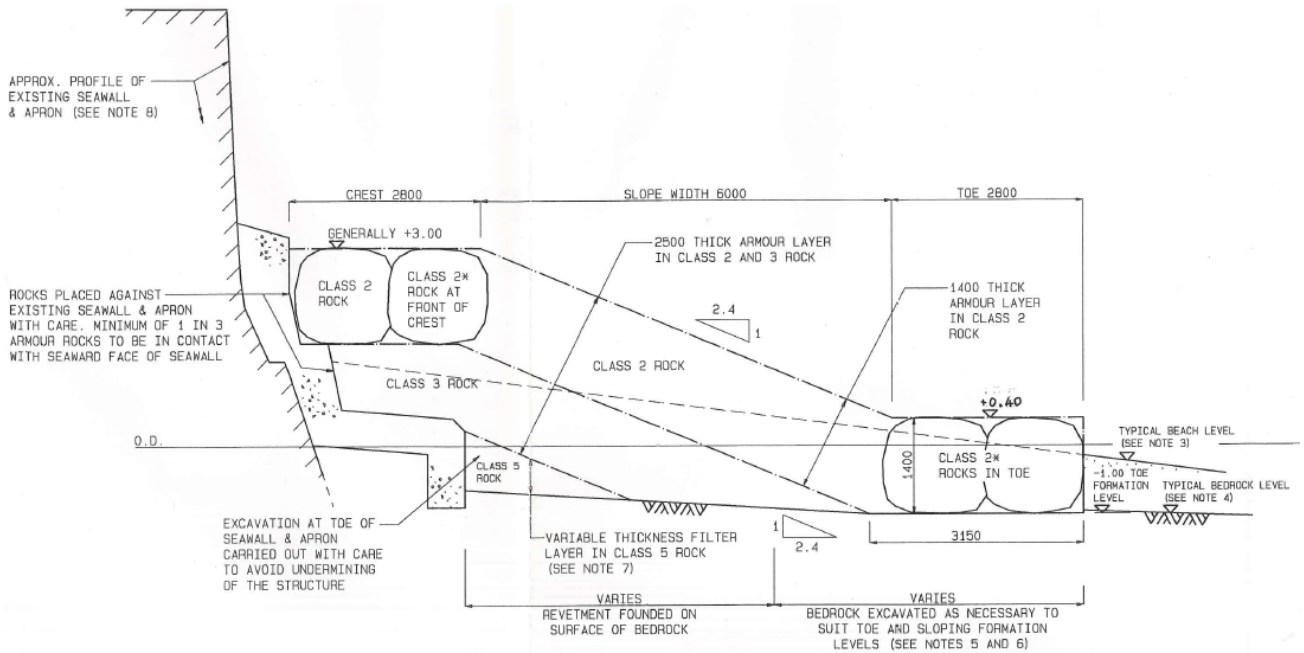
Clifton Beach rock revetment construction detail for the 1995 Phase II works (from Posford Duvivier, 1995)
